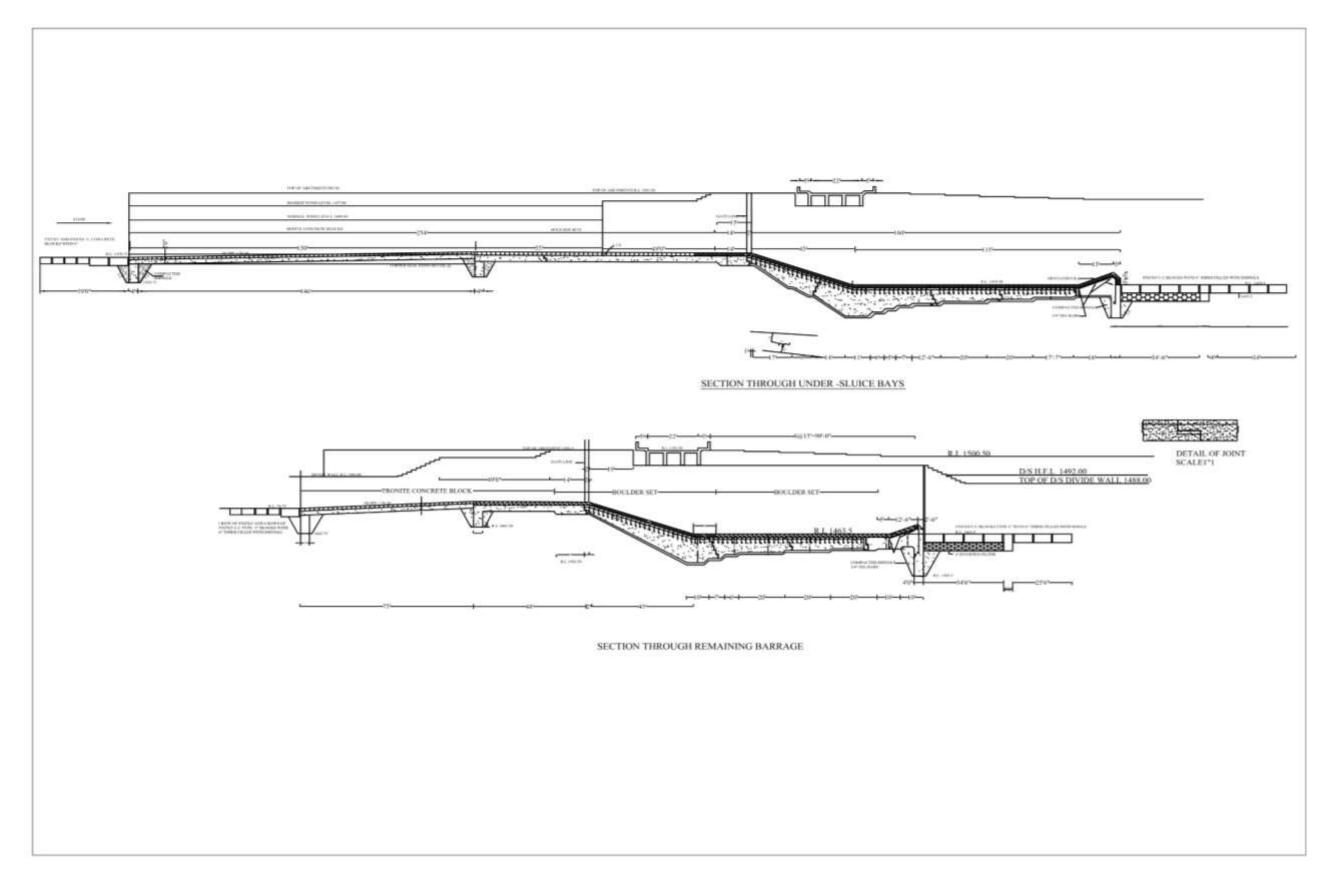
Section through Main spillway bays of Dakpathar Barrage
